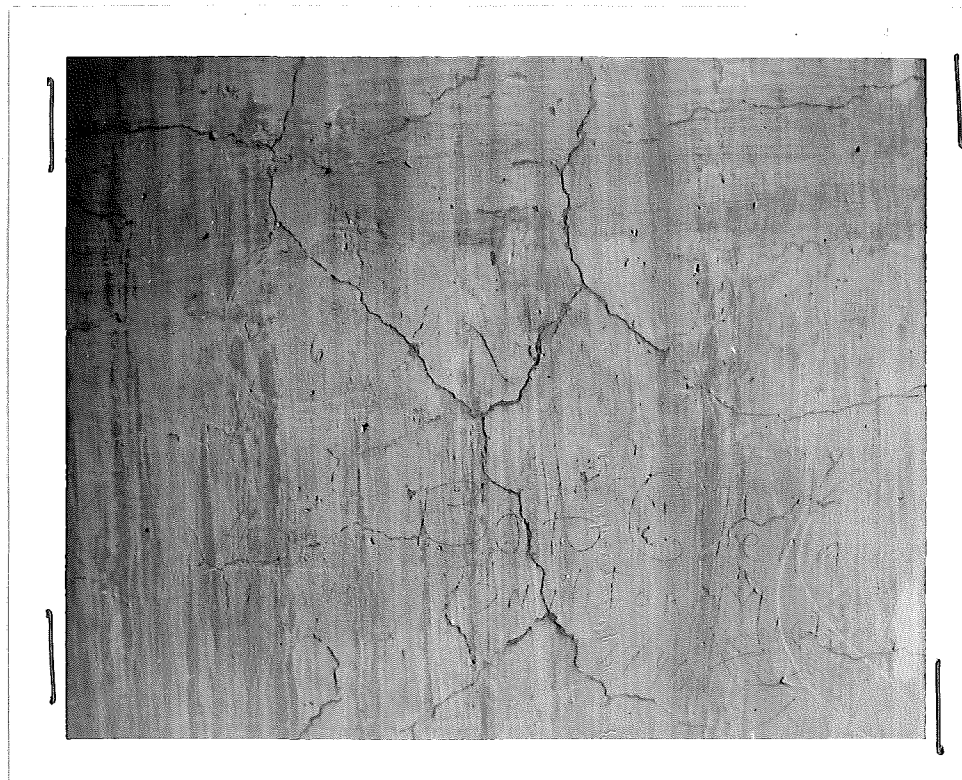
Cracking cracks showing through portland cement paint coat at Howell. Paint is starting to flake off at crack edges.
